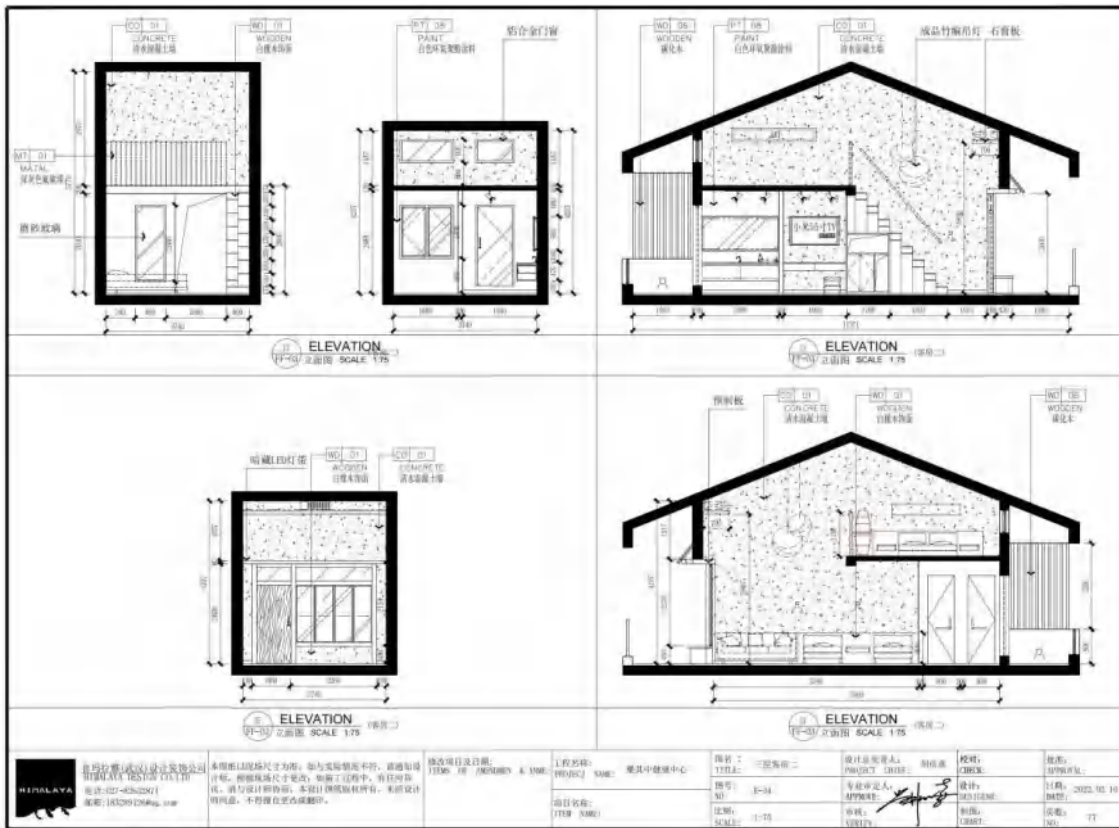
Elevation of guest room(Source: author’s drawing)
